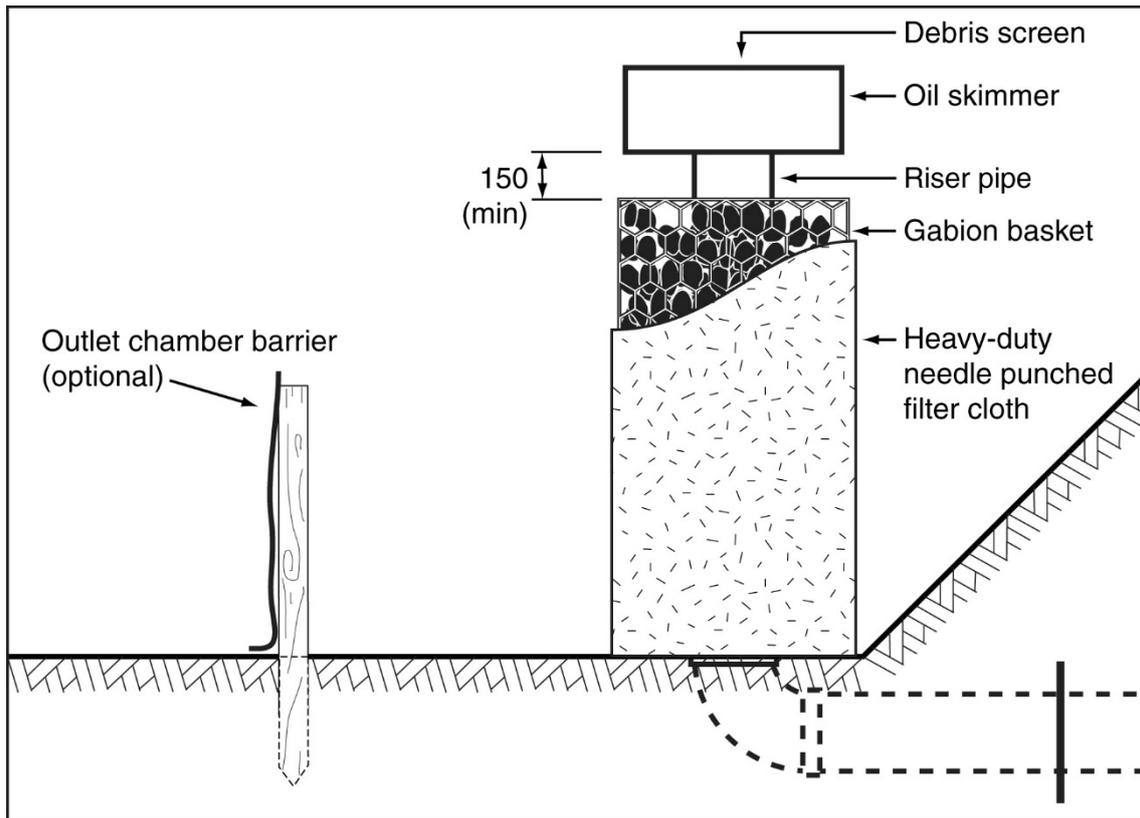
Typical details of riser pipe outlet with rock-filled gabion baskets
